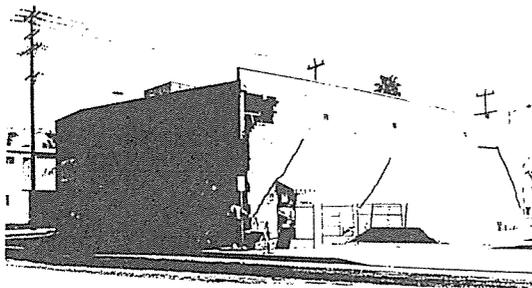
Damaged Unreinforced Masonry(URM) Wall (Major Cracks are Highlighted for Identification)[28]
